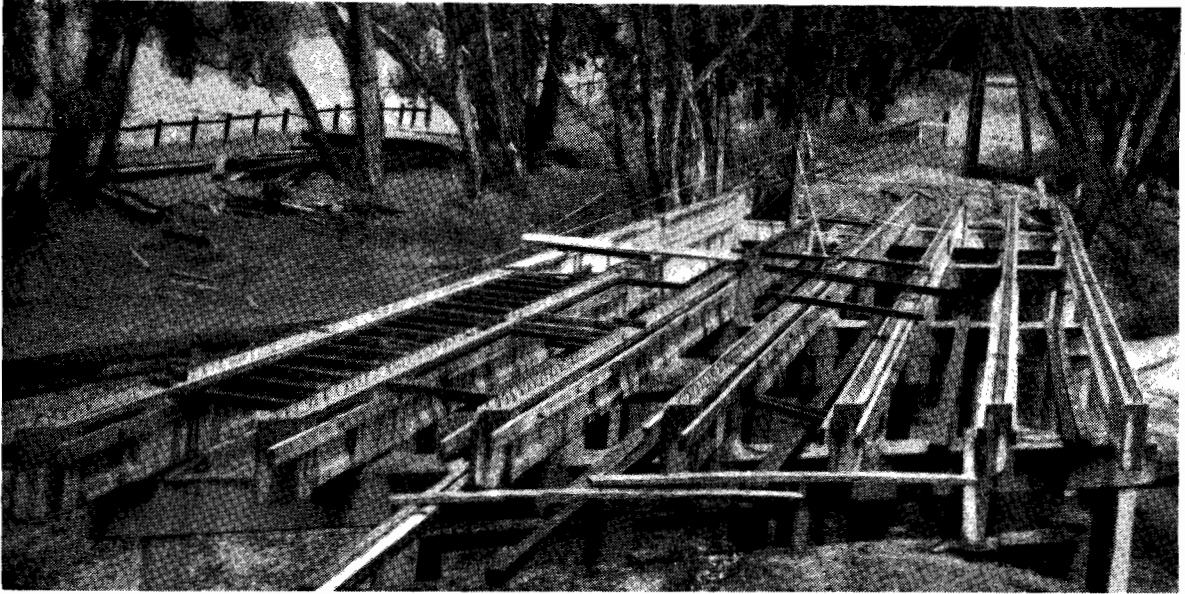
Bridge under construction over Mclvor Creek, on the Northern Highway, near Tooborac.
